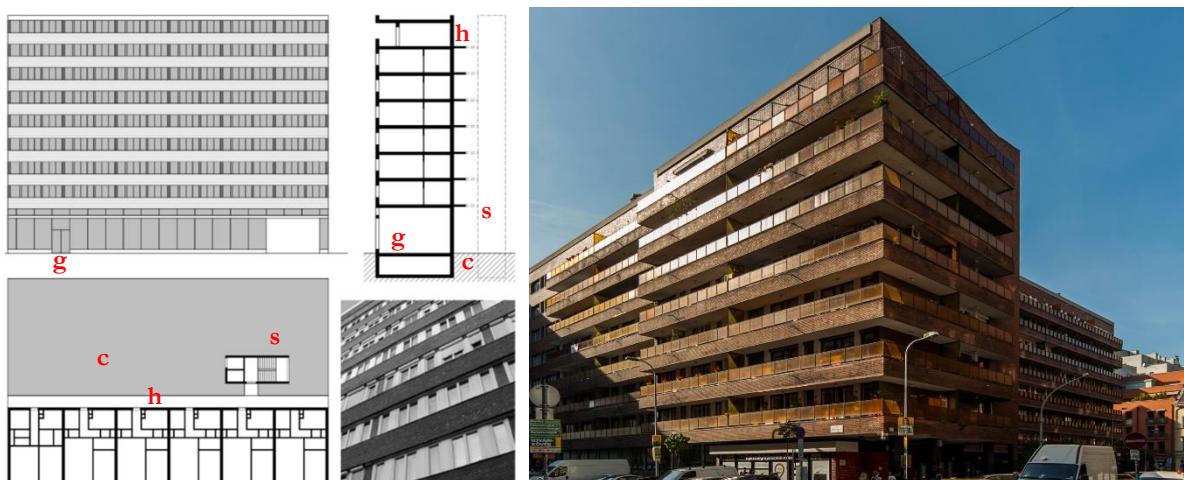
Left: Example of a Socialist Modernist building. Façade, layout, section and detail of a building. Right: Another example façade from the case study area. (c = courtyard, backyard, g = gate, s = staircase, h = hanging corridor) (source: Authors' own figure)
